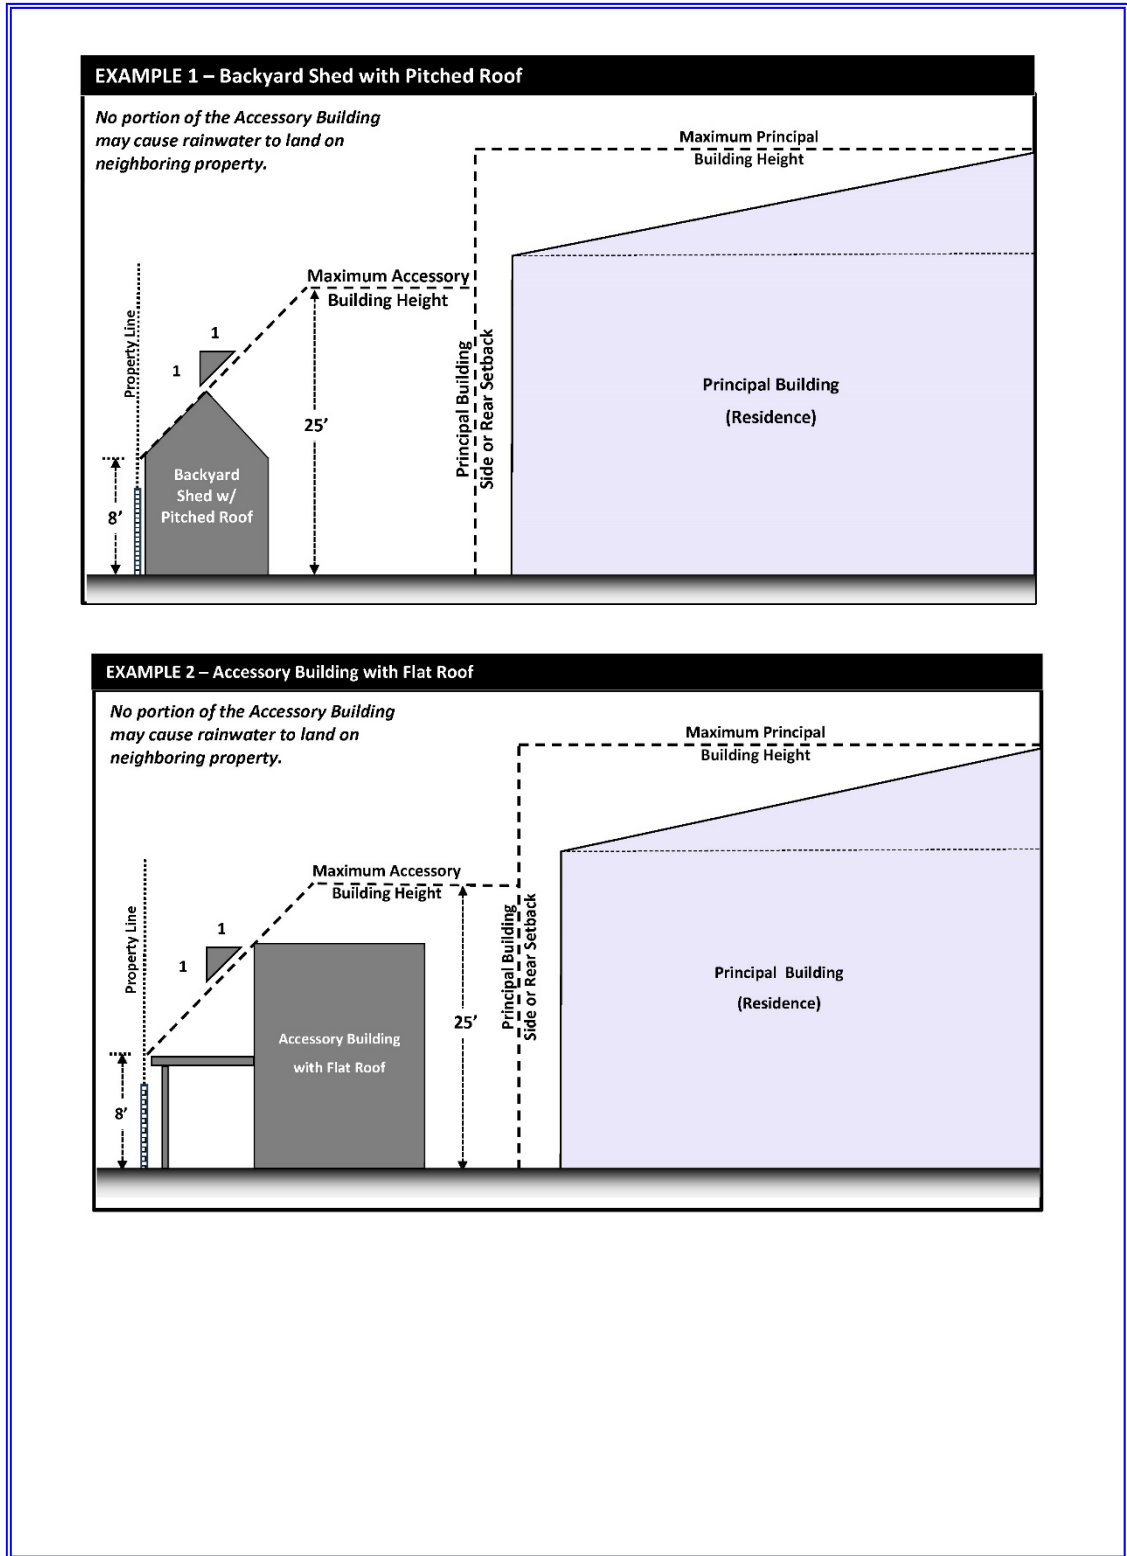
Accessory Buildings and Uses: Text Amendment (TA23-01)
